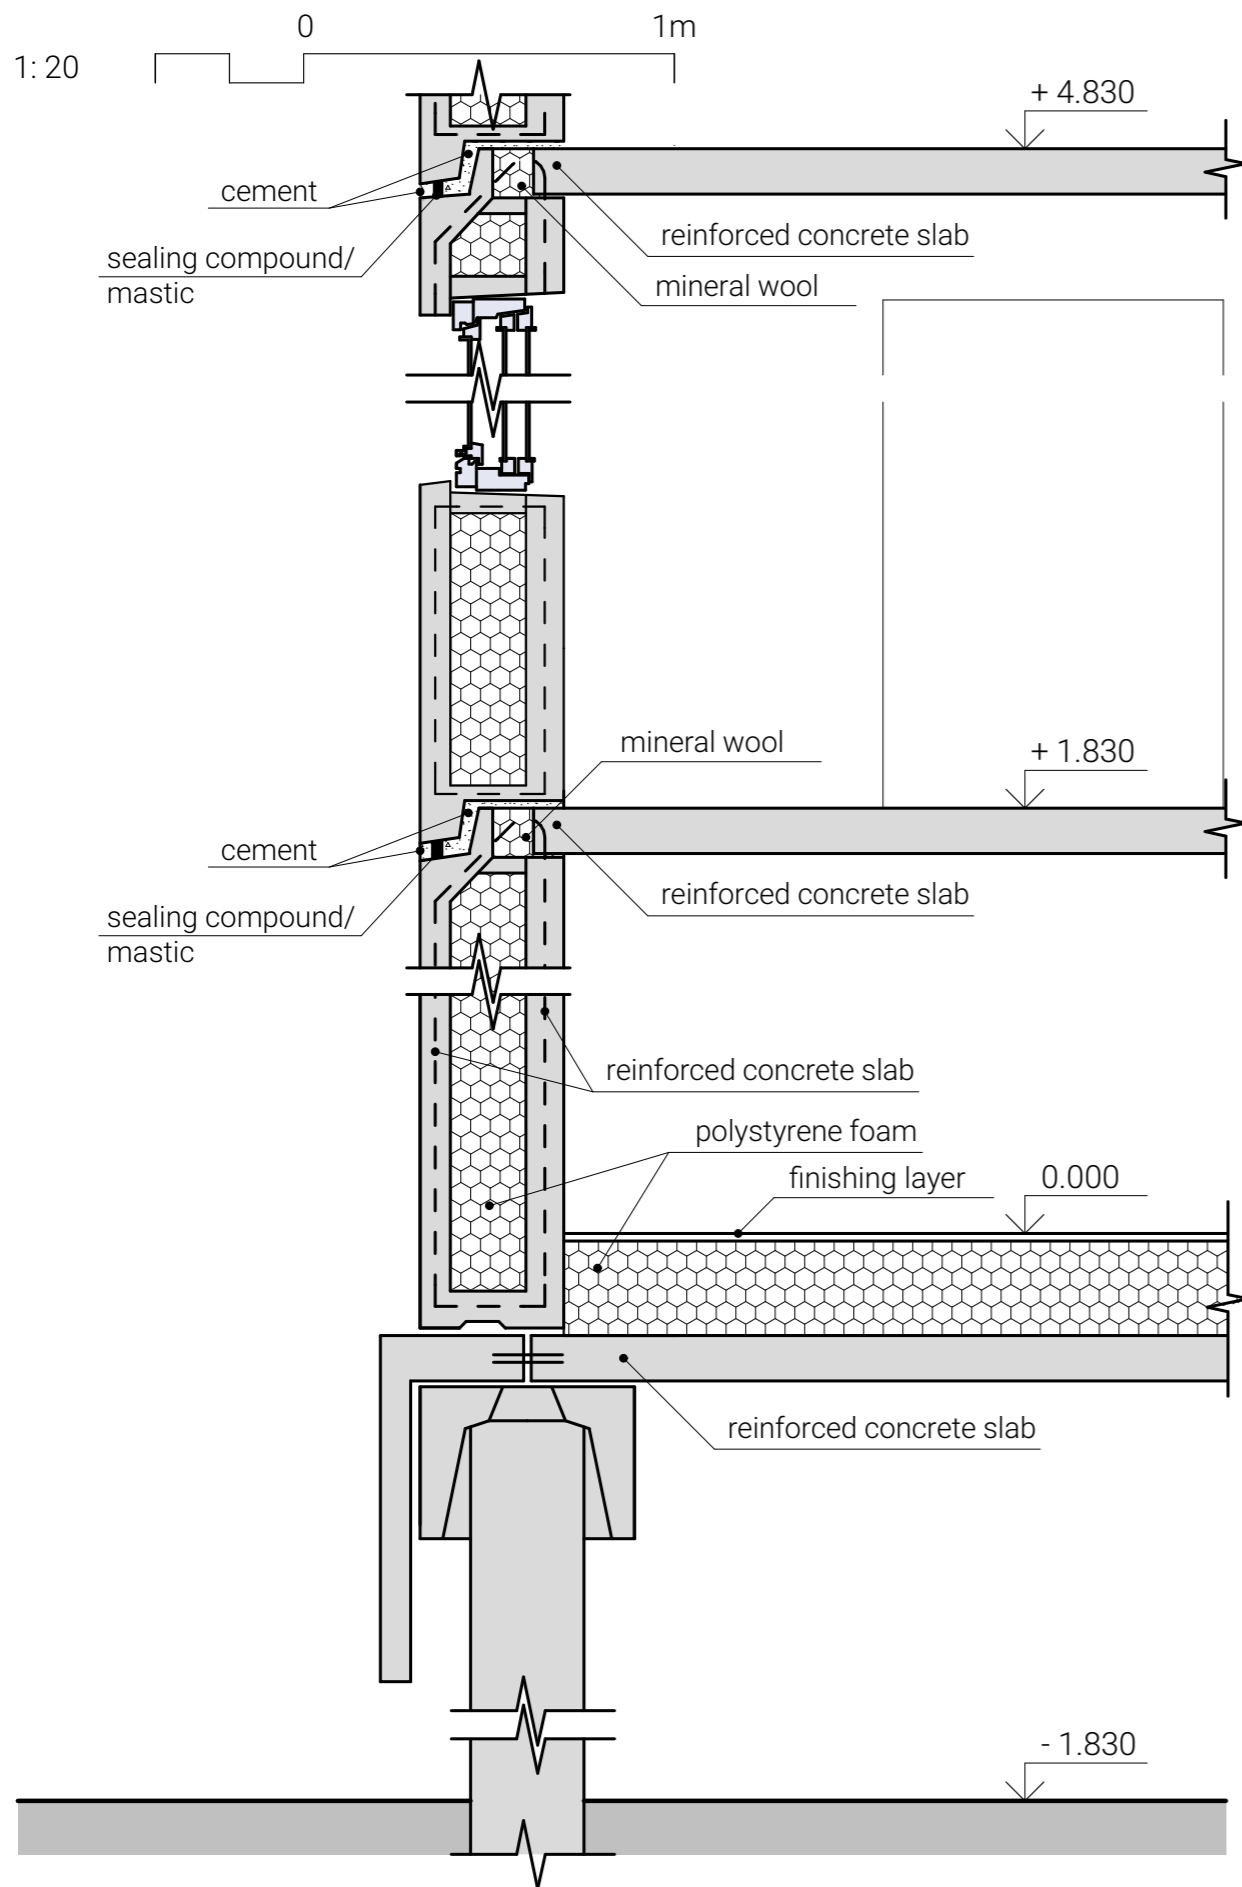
(on the right): A detail of the stilt foundation: 1- stilt, 2- pile head, 3- slab, 4- basement screen, 5- ribbed floor slab, 6- connection joints, 7- inner wall panel, 8- external wall panel, 9- concrete, 10- mineral wool (Vaskovskij A. P. Shkliarov N. D. 1979)
